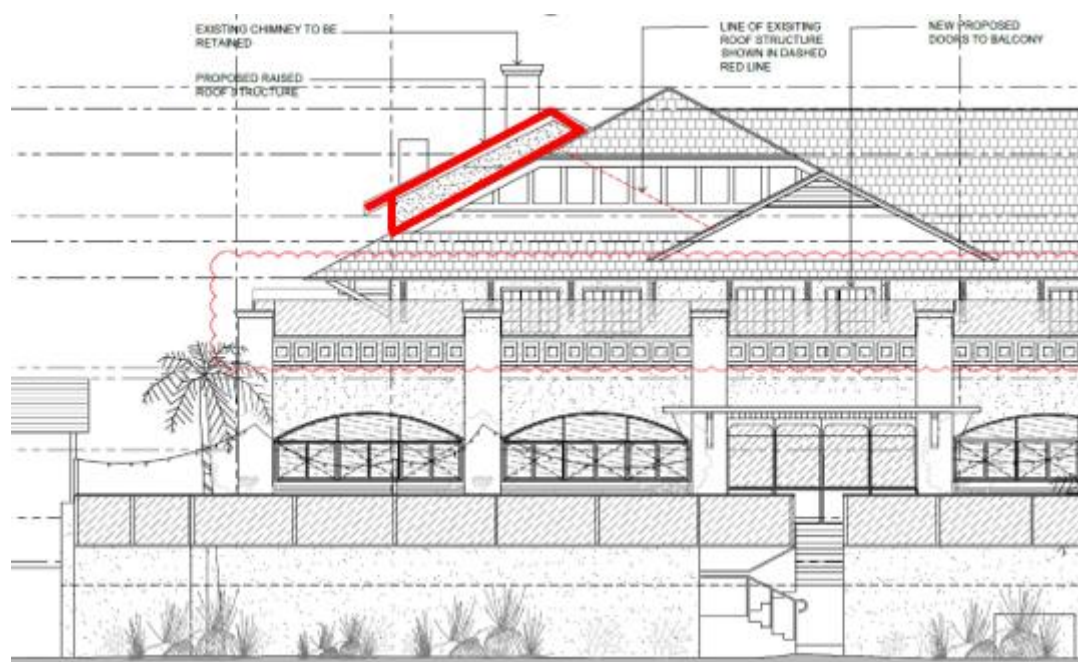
Plan extract northern elevation showing the height non-compliance based on ground level (existing). The red line shows the extent of proposed new works located above the height standard as viewed from this elevation.
